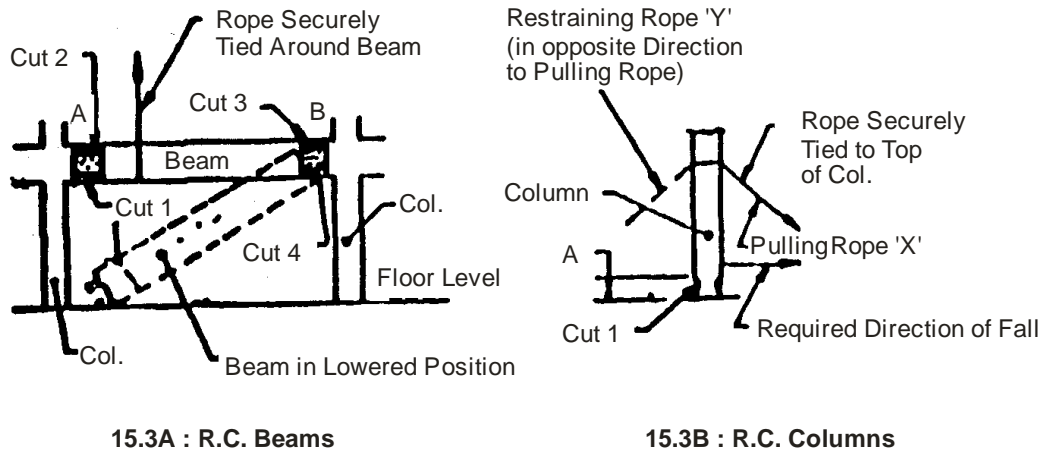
Hand Demolition of In-Situ Concrete Structure
